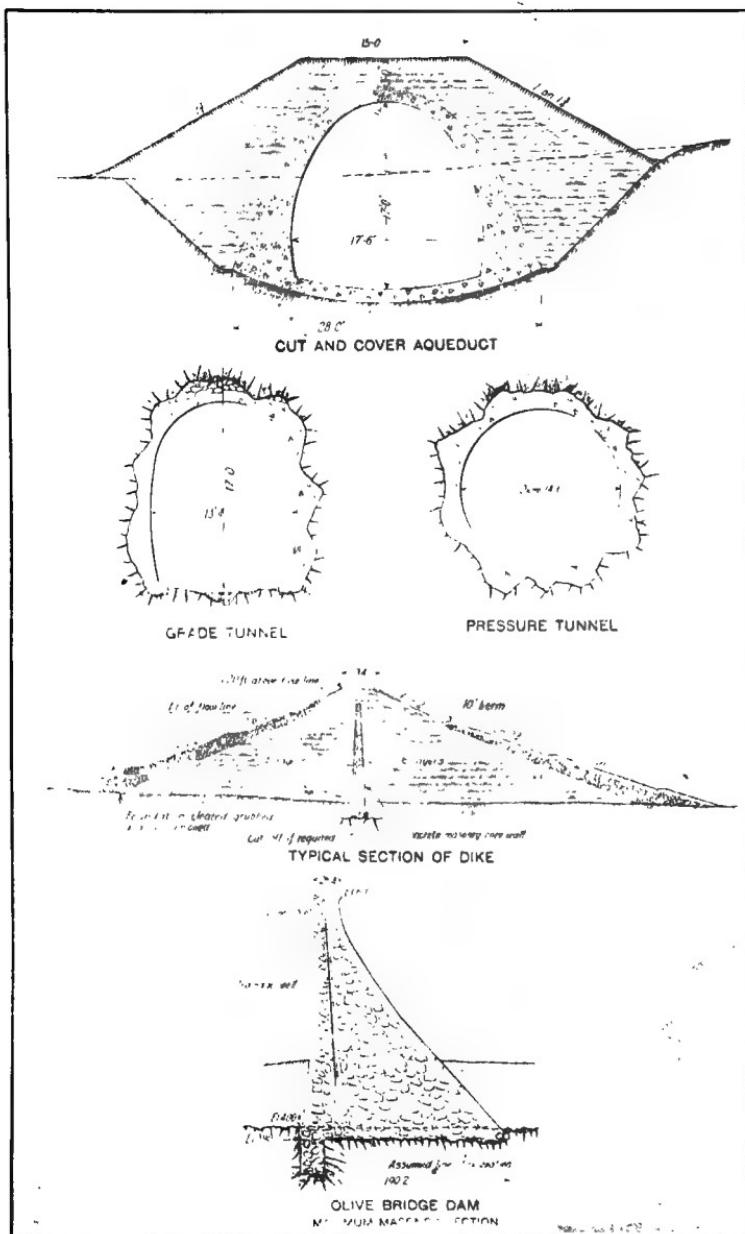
CROSS-SECTIONS OF AQUEDUCT, AND OF EARTH AND MASONRY DAMS.
